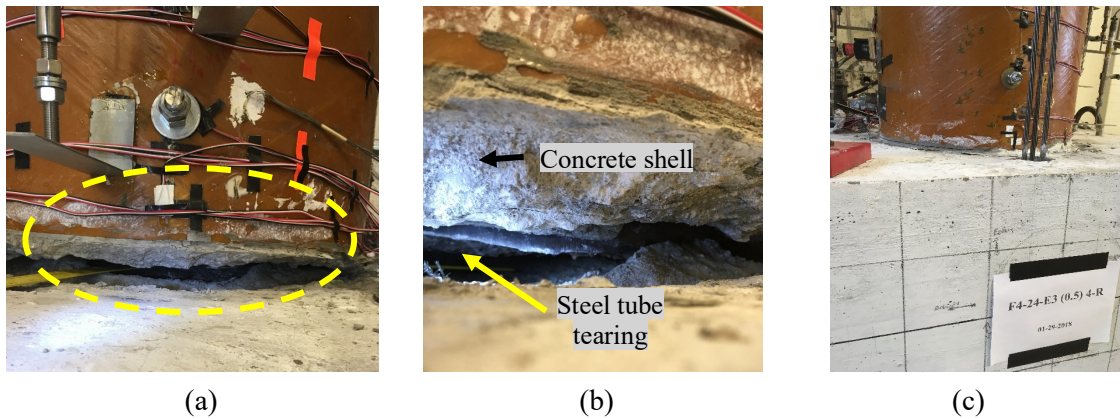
F4-24-E3(0.5)4-R column (a) steel tube inward buckling and tearing at the interface joint at 6% drift, (b) close-up view, and (c) undamaged footing
